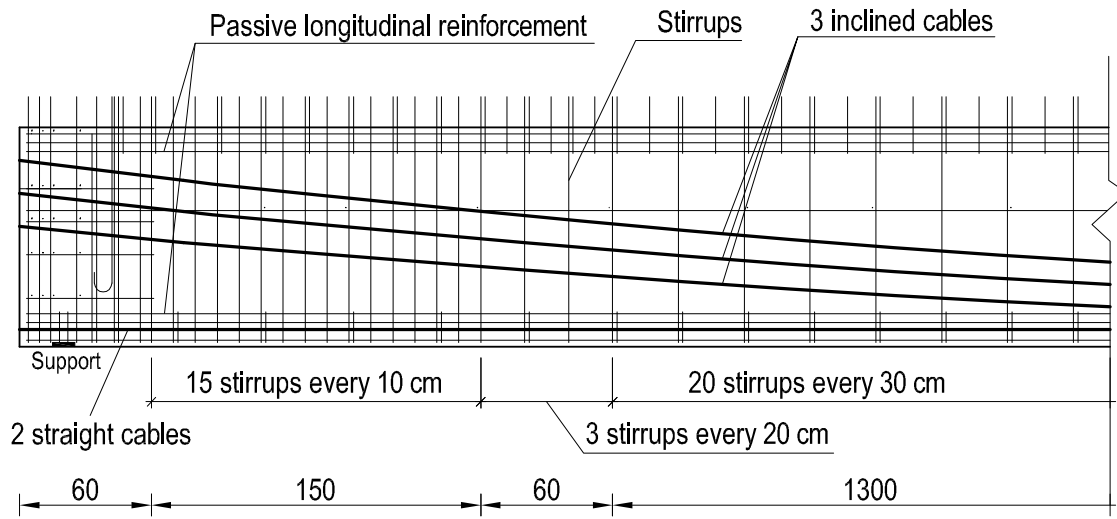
Extract of flexural (passive and prestressed) and shear reinforcement over a part of the girder length (without the upper slab)
